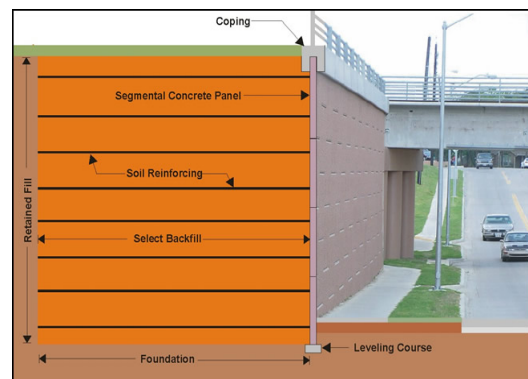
MSE WALLS: TYPICAL COMPONENTS
